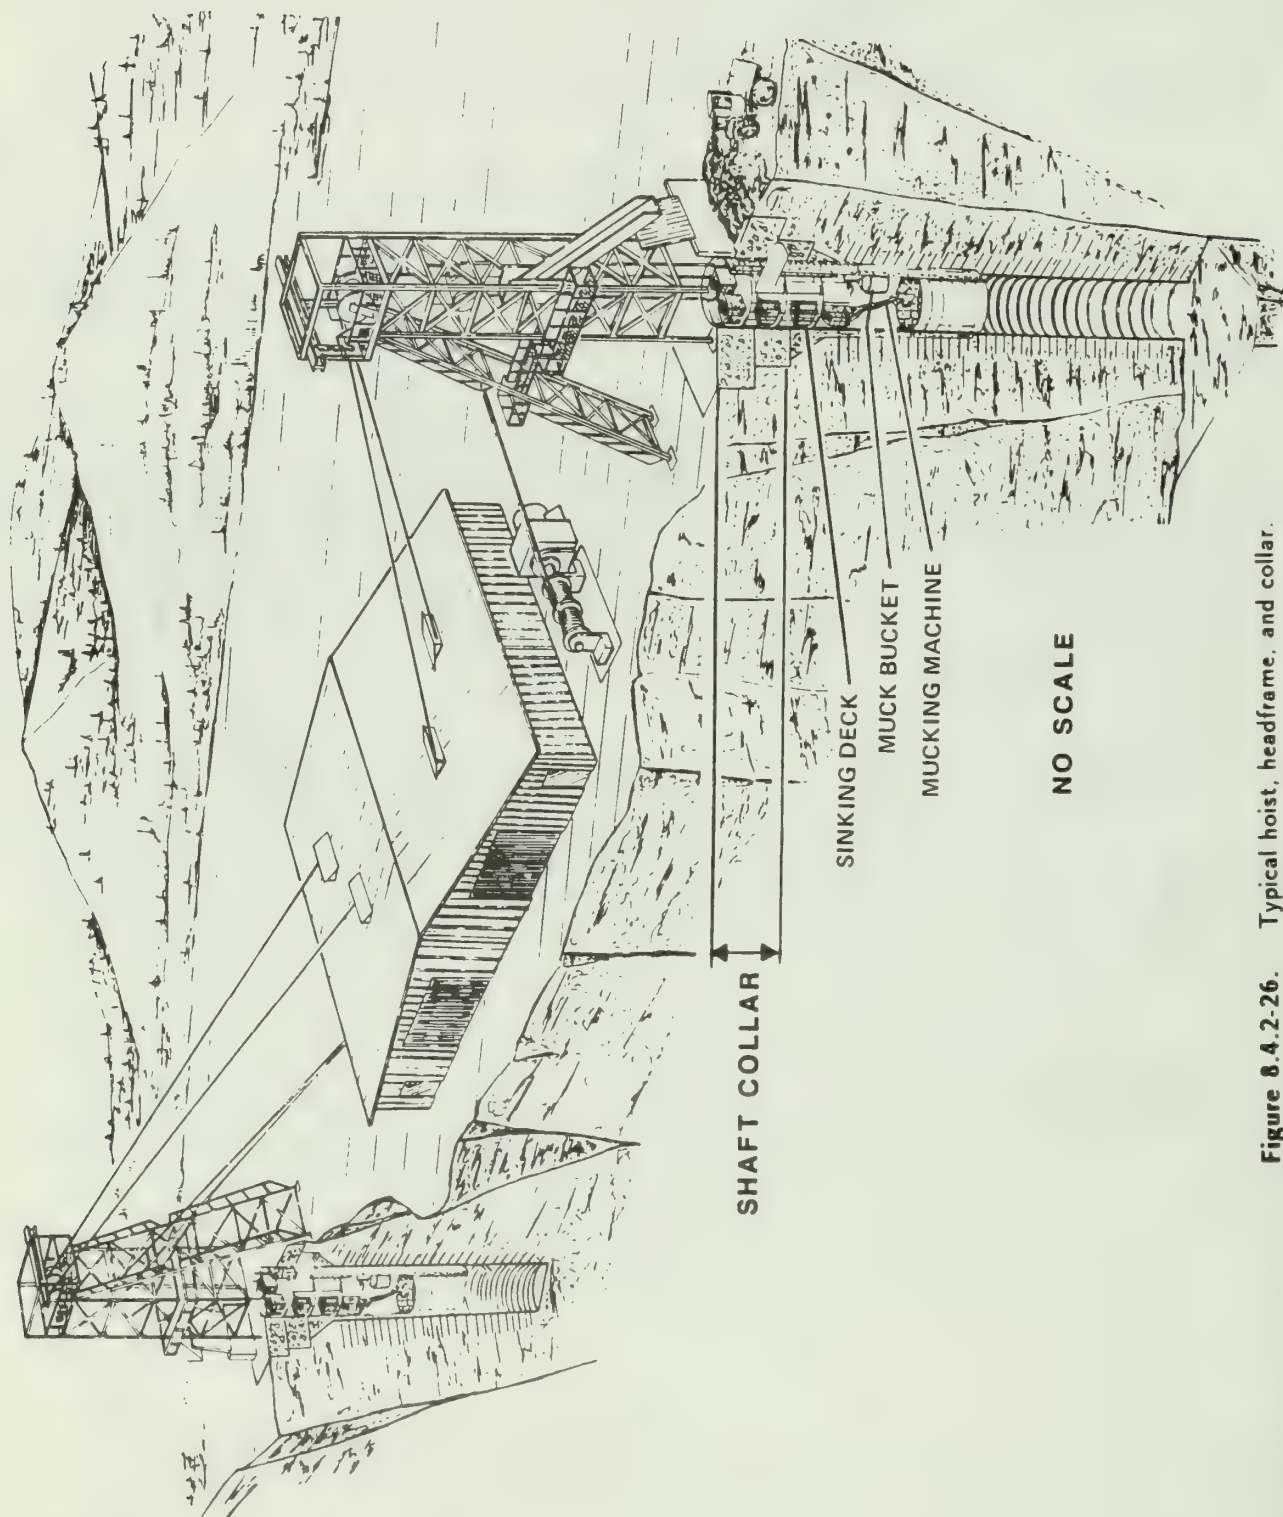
Typical hoist, headframe, and collar.
